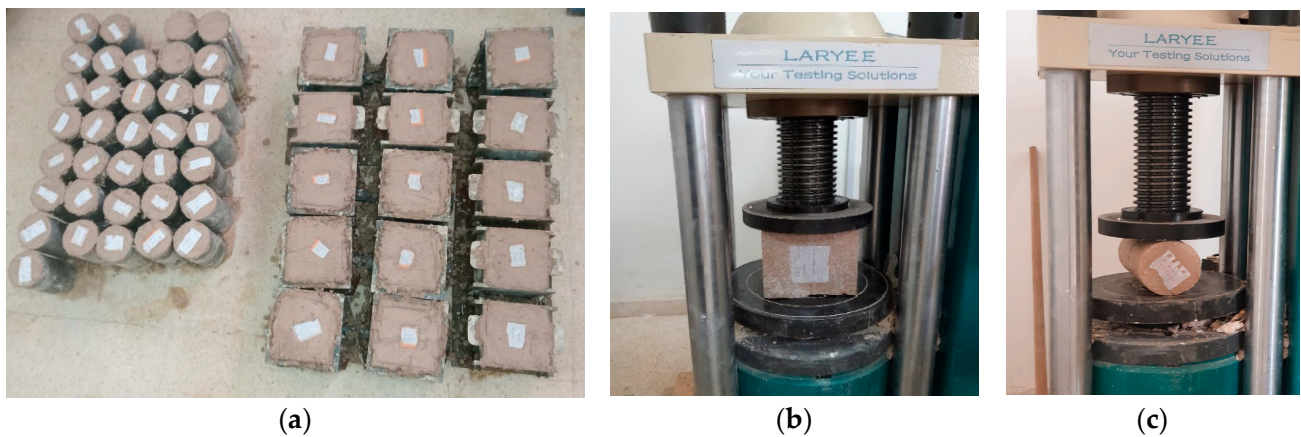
(a) Molded concrete specimens. (b) Compressive strength test. (c) Splitting tensile test.
